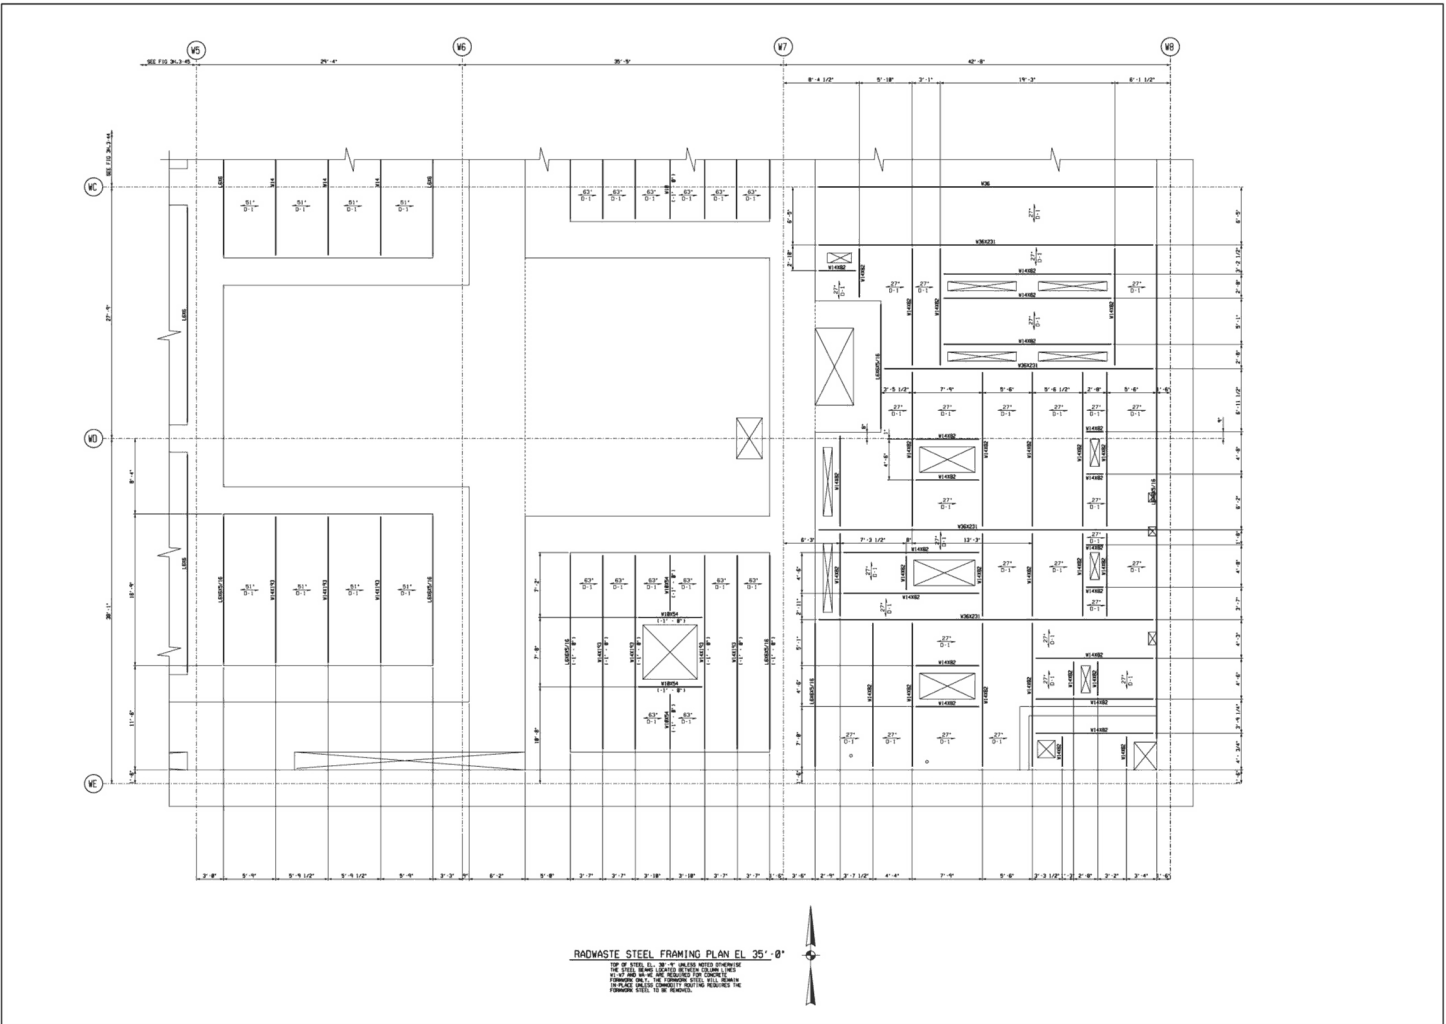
H.3-46 El 35'-0" Steel Layout Between Column Lines W5-W8 and WC-WE
